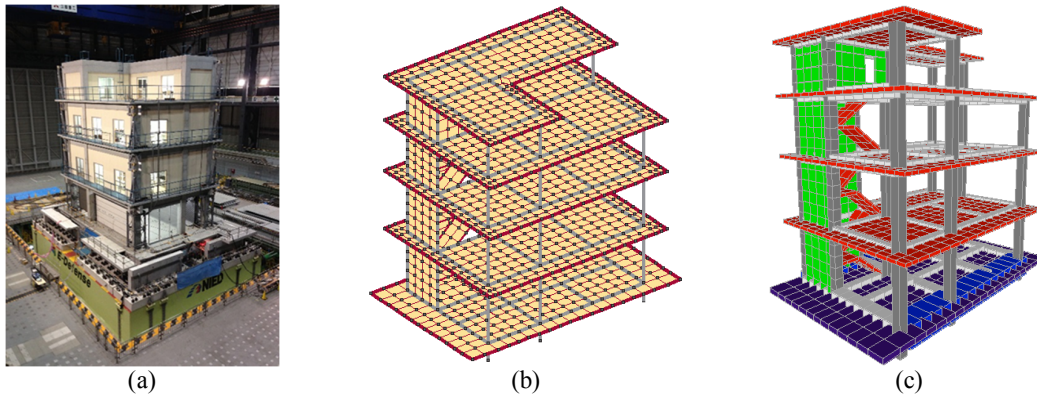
The base-isolated building specimen: (a) photo at the E-Defense testing facility; (b) FEM (discretized view); (c) FEM (extruded view)
